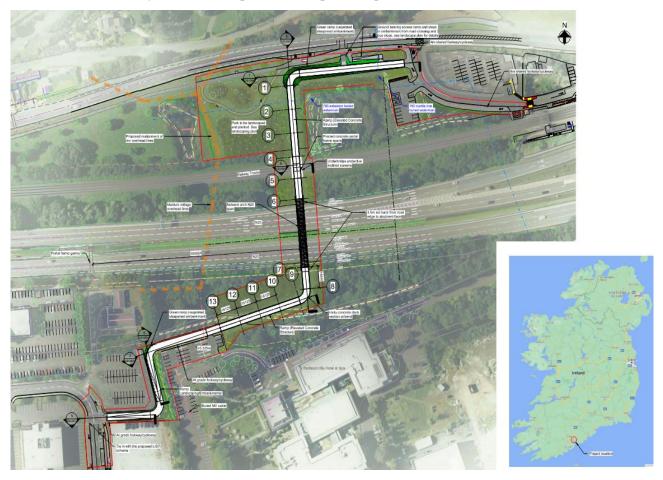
Site layout map. Not to scale. Extract from site layout plan drawing – refer to Drawing No. LIPB-ARUP-ZZ-XX-DR-CB-0003 in Volume 3 of this EIAR.
